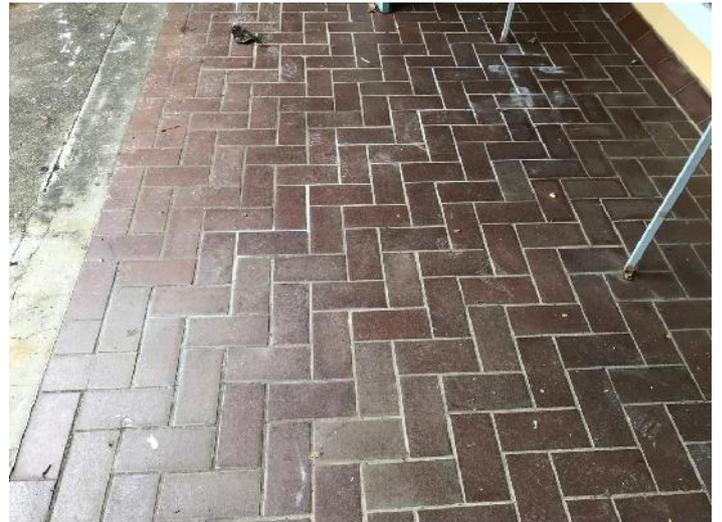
Loading dock ceiling removed. No visible Ac debris remains on timbers or surface below
